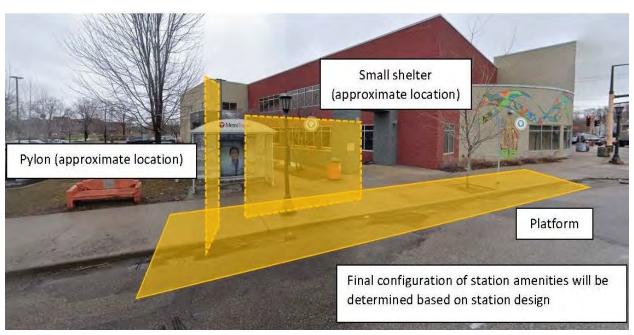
Cesar Chavez Street and State Street South proposed northbound platform.
